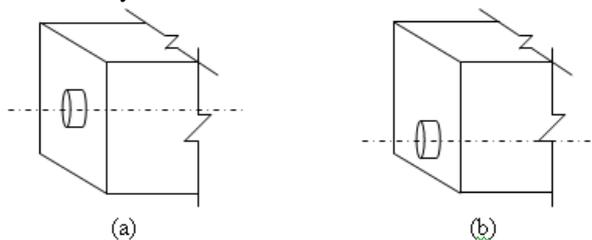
Idealization of Anchorage zone block in prestressed post-tensioned concrete beam subjected to (a) concentric loading (b) eccentric loading
